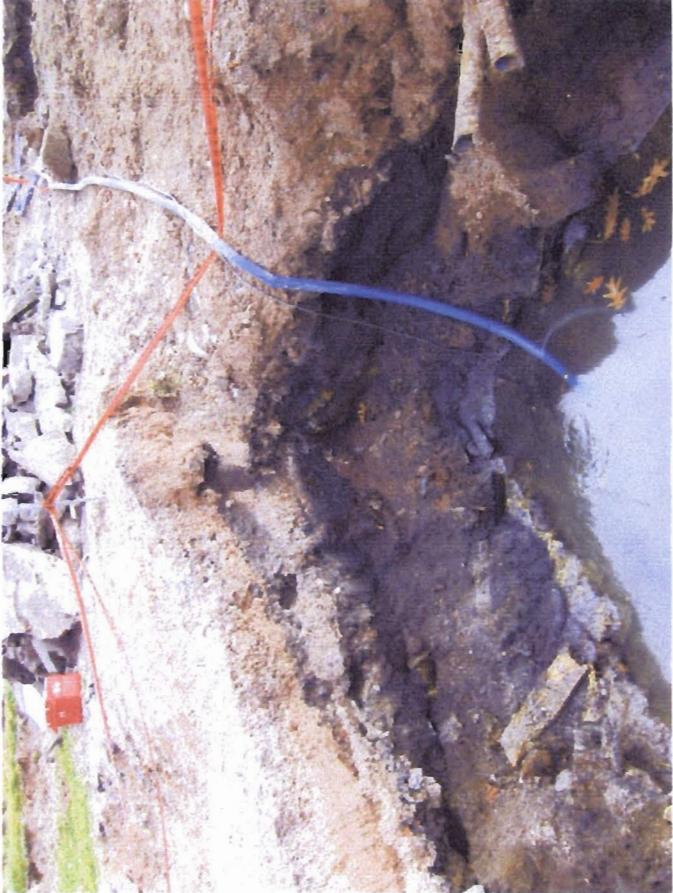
Close up view of test pit TP-2 showing the sheen on water in excavation and layered materials in sidewall.
